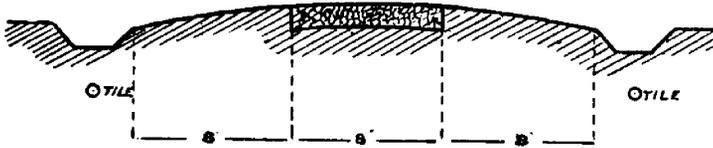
CROSS SECTION OF COUNTRY ROAD.
